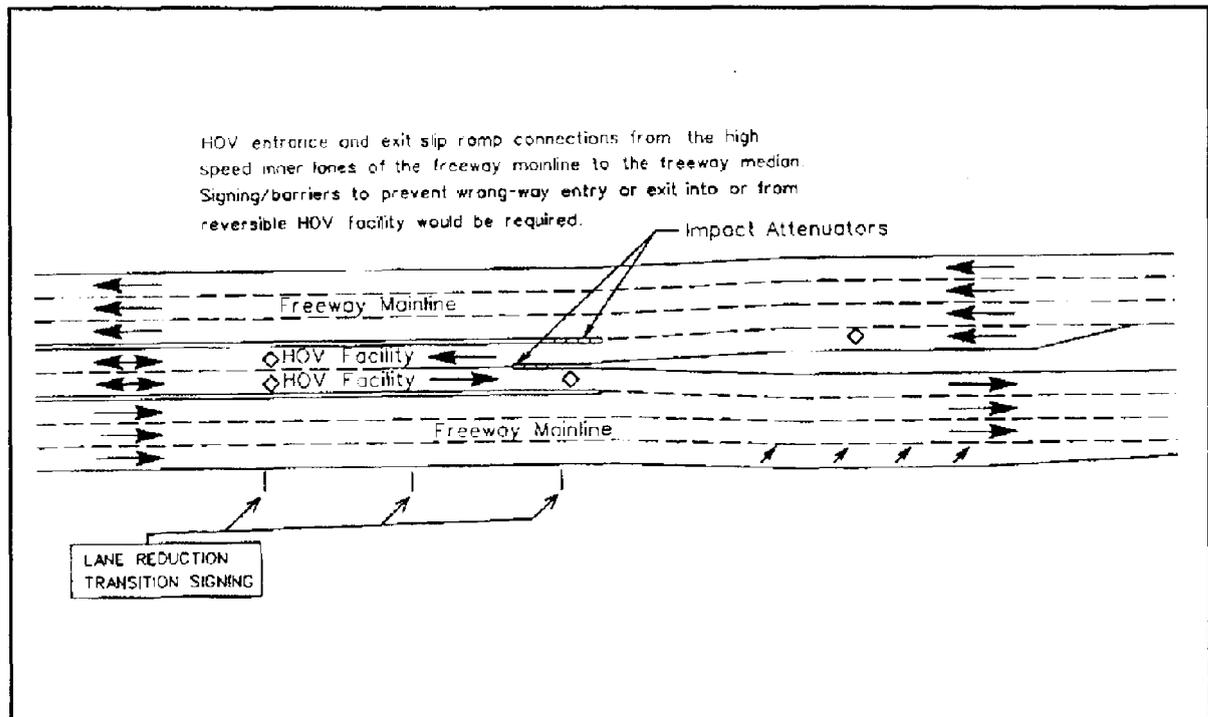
Terminal Slip Ramp Connection.⁽¹⁰⁾
